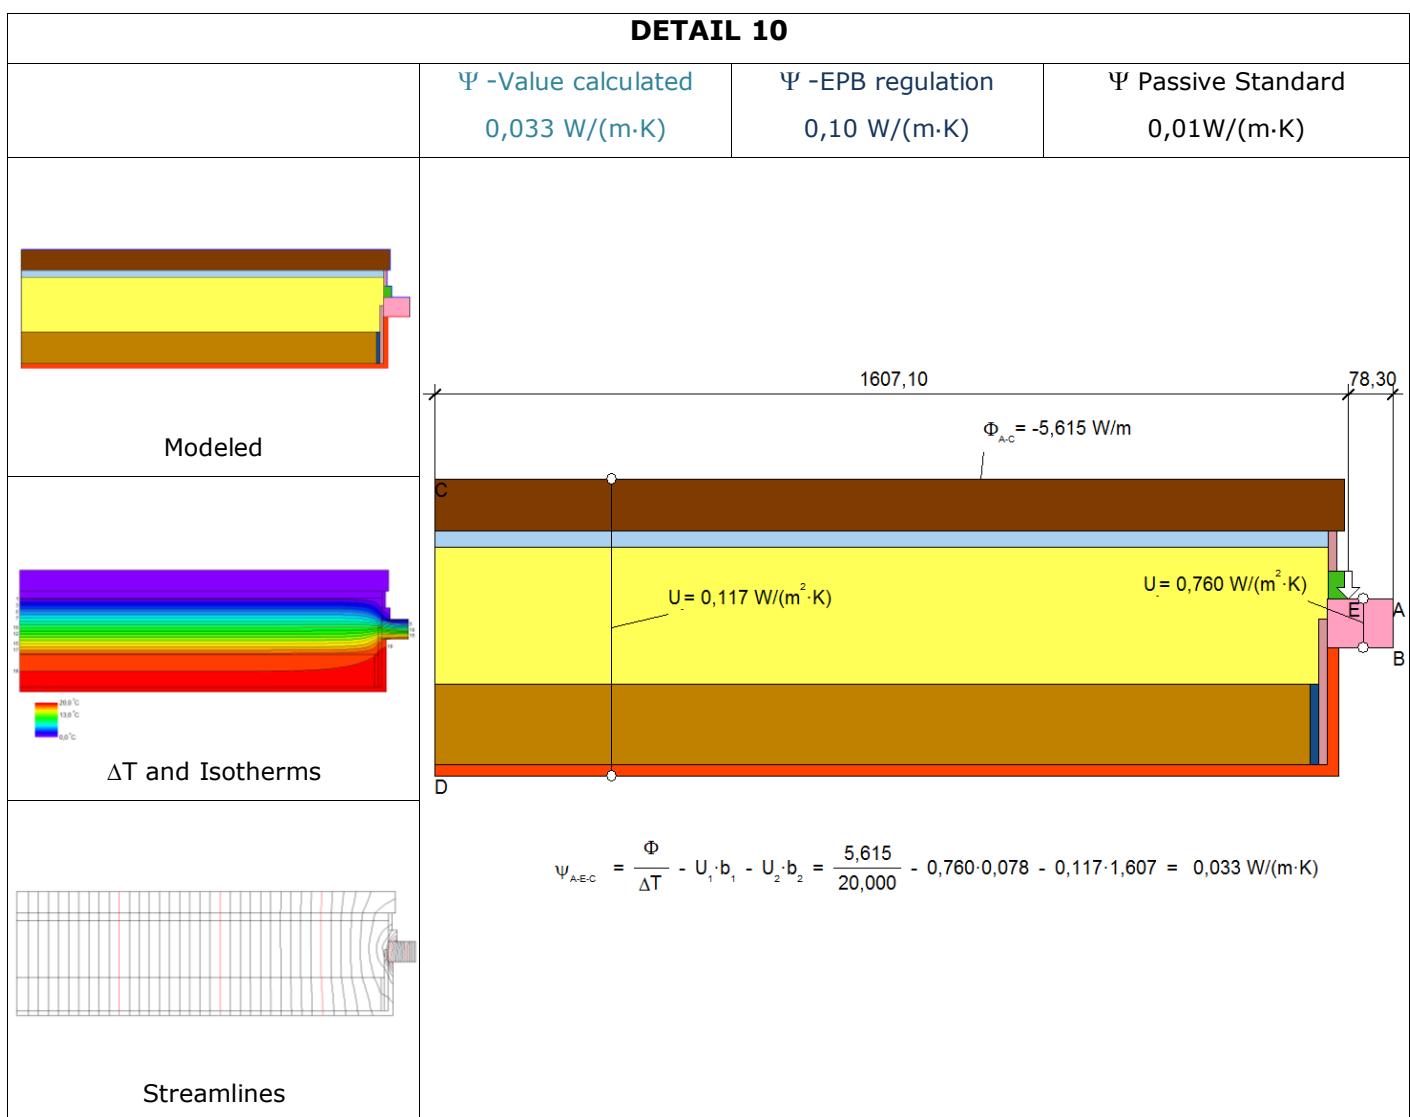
shows the results for detail 10, i.e. connection external wall to window frame with blind rail outdoor on first floor at the south side of the building (horizontal section). It is the same than detail 9 just adding the blind rail outdoor. Timber is used to guarantee a continuous insulation layer.
